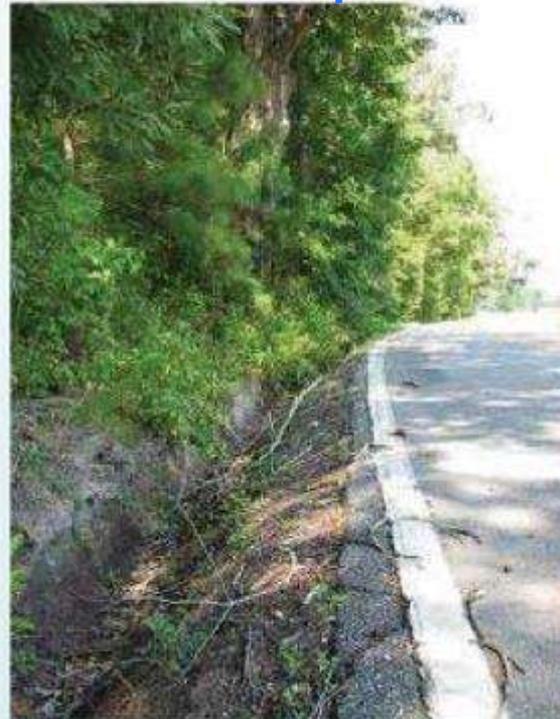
PHOTO SHOWS THE LACK OF A PAVED SHOULDER AND CLOSE PROXIMITY OF FIXED OBJECTS TO THE ROADWAY.
